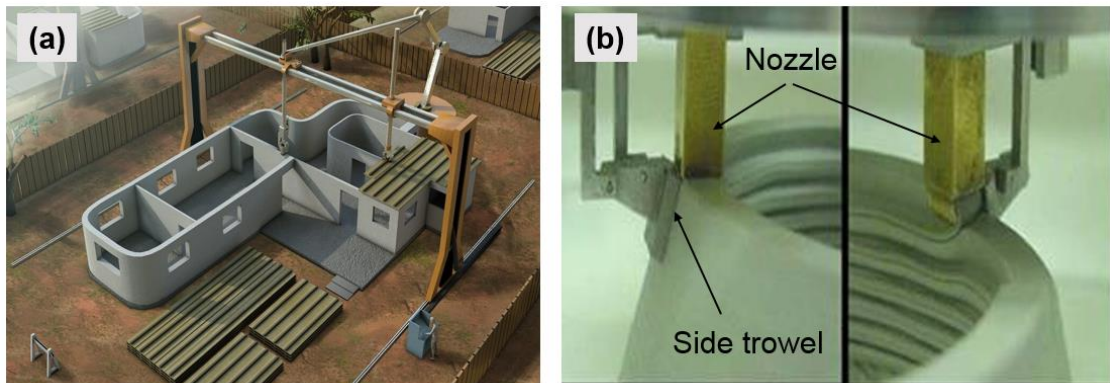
(a) Contour crafting process (b) extrusion nozzle with a side trowel [113]
